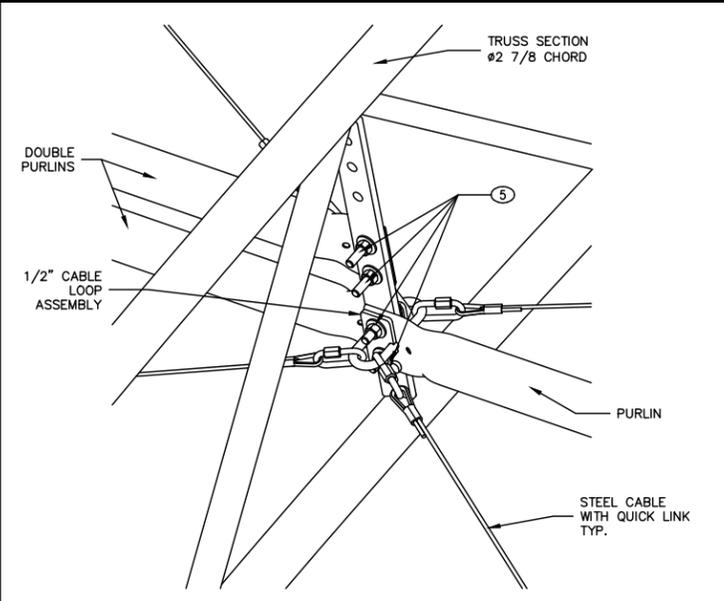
RIDGE PURLIN AT WELD IN WEB DOUBLE TO SINGLE PURLIN
